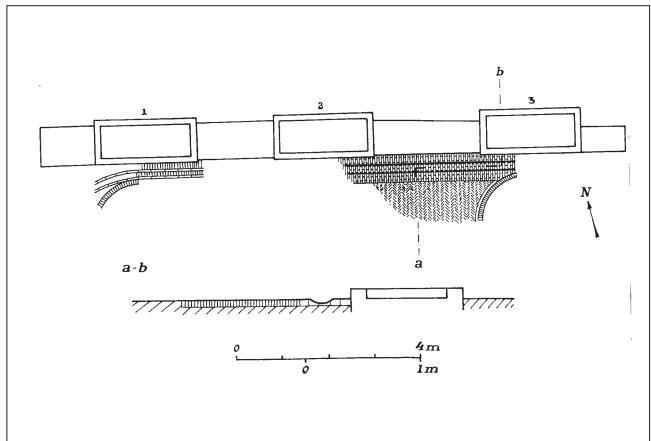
Ground plan and plan of rectangular pools (Gnirs 1915, Bezecky 1998)
